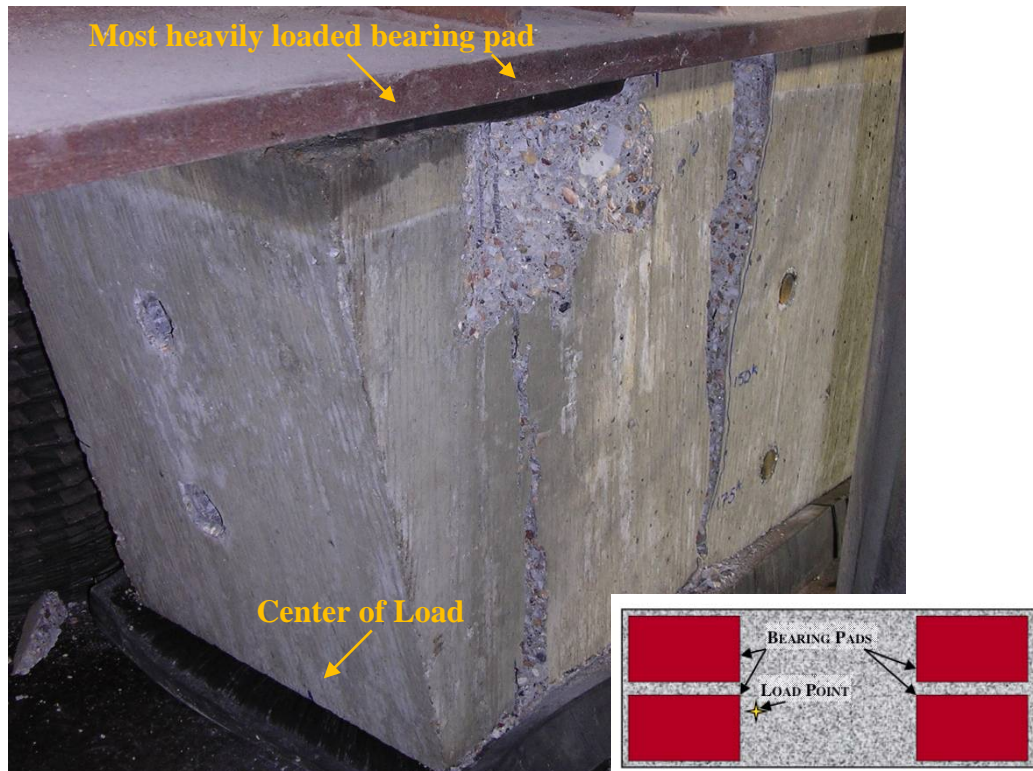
Undamaged Control Specimen's First Cracking
